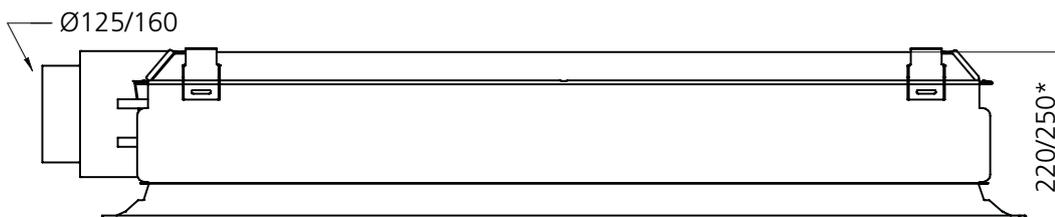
Dimensional drawing, side view. Air connection on the short side - pos 1.
